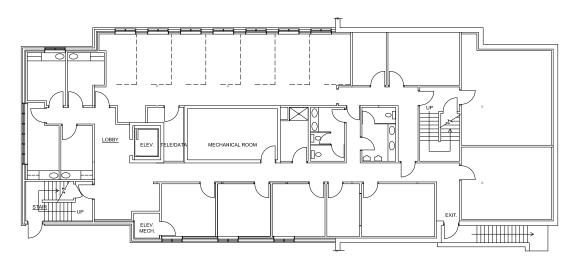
EXISTING LOWER LEVEL PLAN
